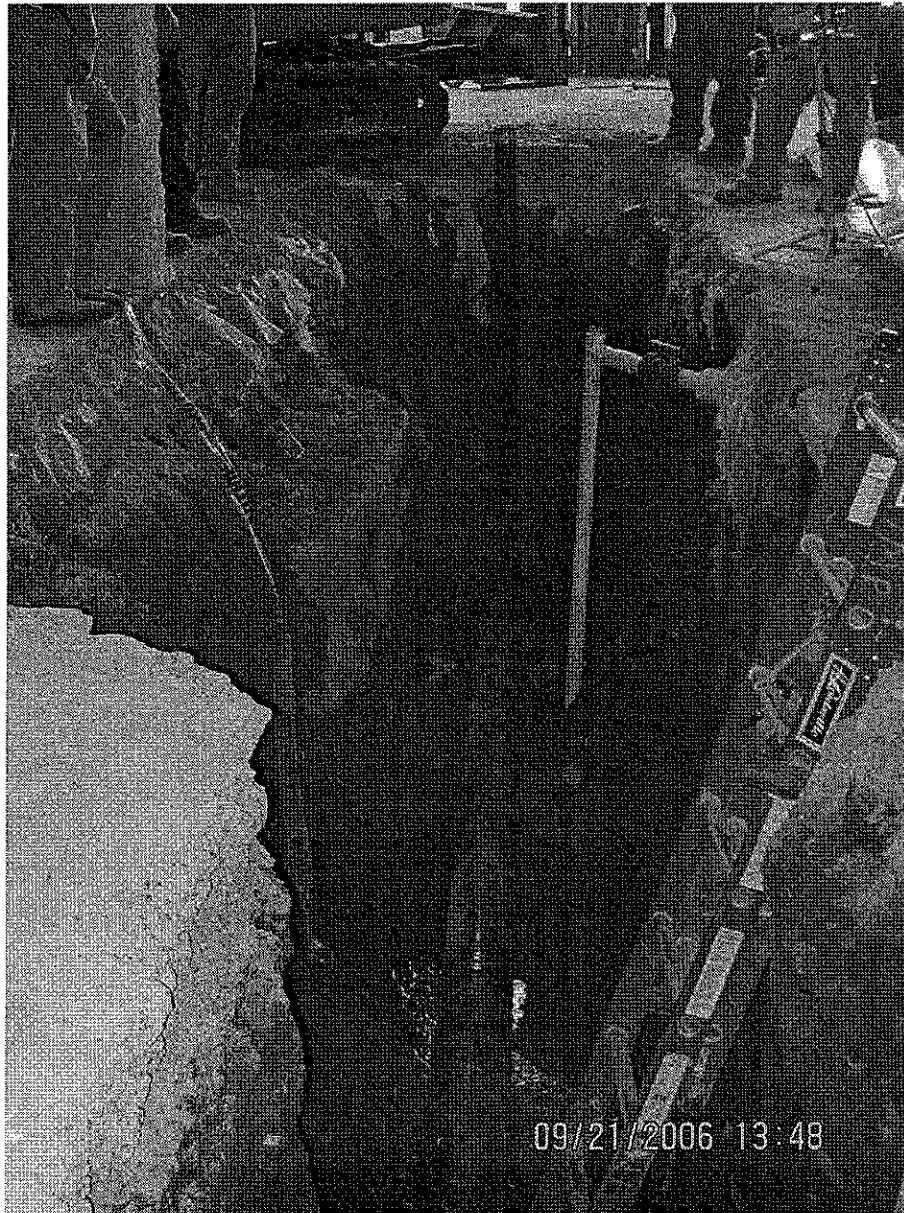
New section of sanitary sewer piping and off-set well VEW-2.
